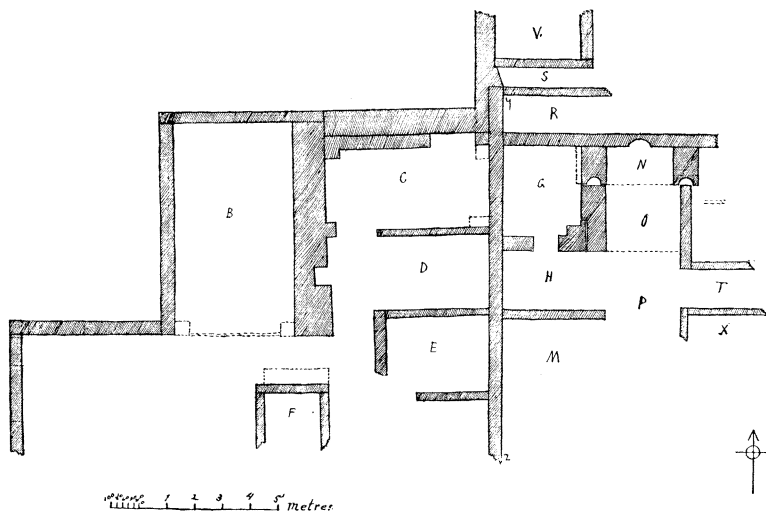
STATION VILLA. PLAN OF MAIN GROUP OF ROOMS.
